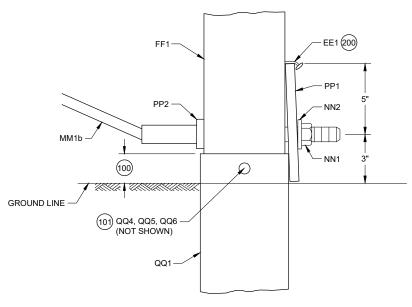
DETAIL "B" STEEL PIPE ASSEMBLY (BEAM GUARD AND W BEAM END SECTION NOT SHOWN)
